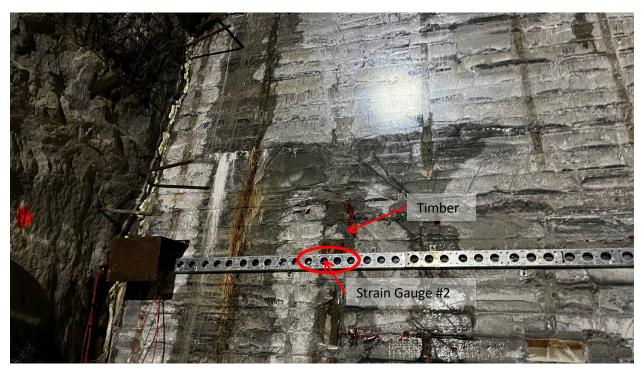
Strain Gauge #2 can be seen behind cable tray, at centre of photo. Right side is installed into timber.
